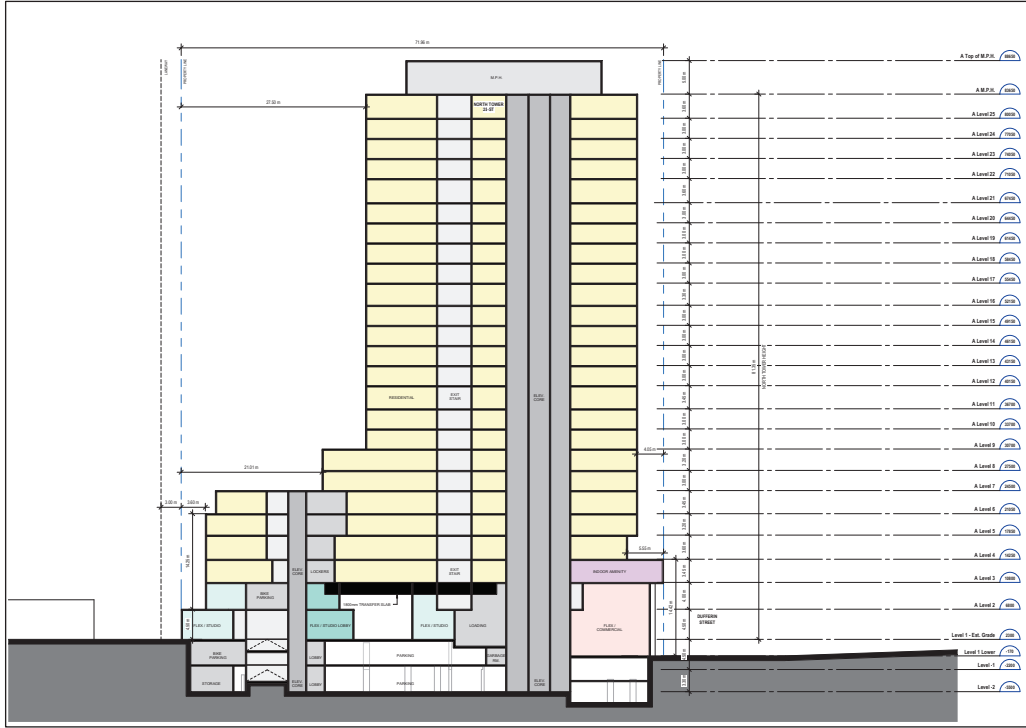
Cross Section Through North Tower (Sweeny & Co)
